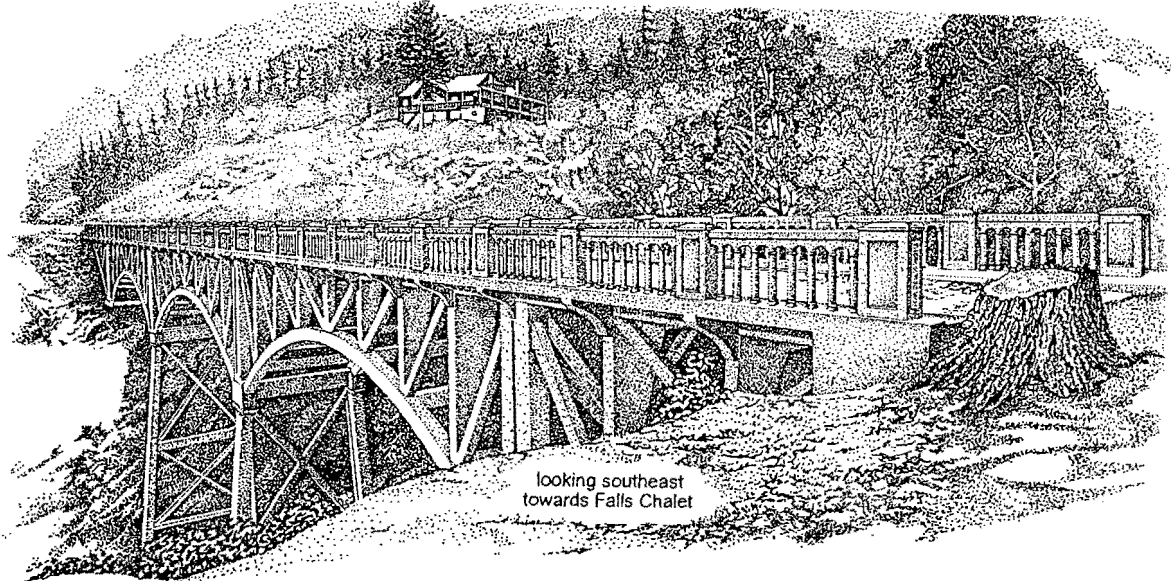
Latourell Bridge looking southeast towards Falls Chalet
